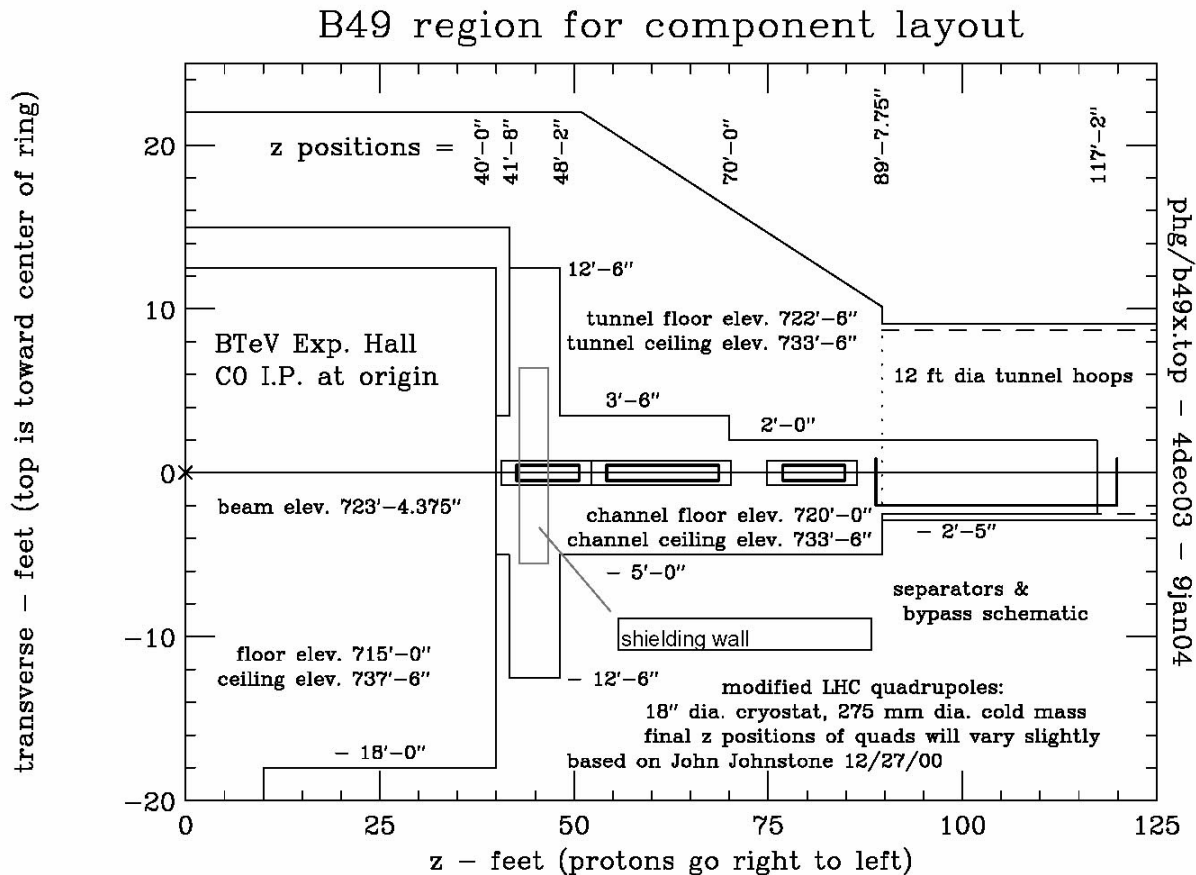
Tevatron tunnel plan view on the B side of the collision hall.
